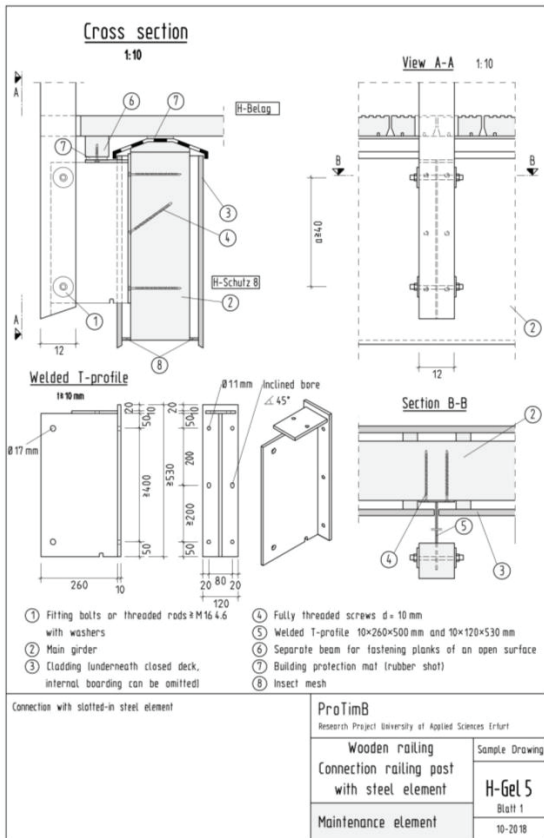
Sample drawing H-Gel 5 explaining the connection of a railing post by a steel element
